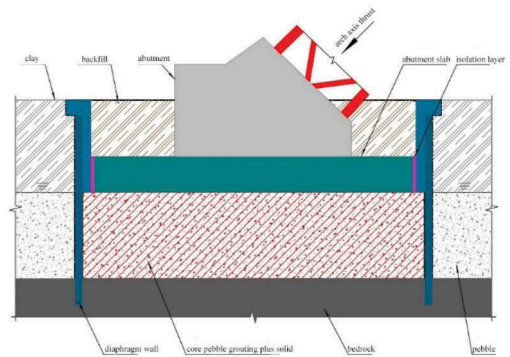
The new composite foundation of 'circular diaphragm wall + grouting reinforcement pebble layer'.
